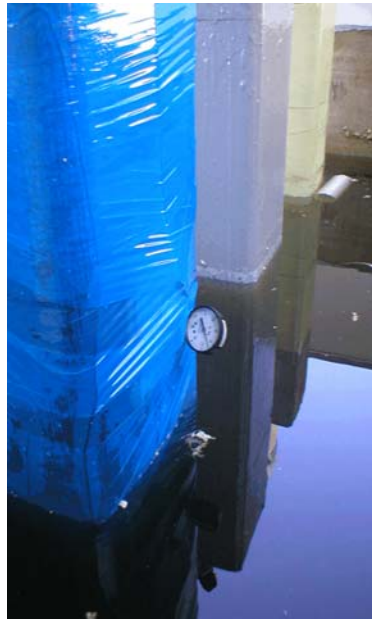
Vacuum System After Final Shrink Wrap Layer Applied
